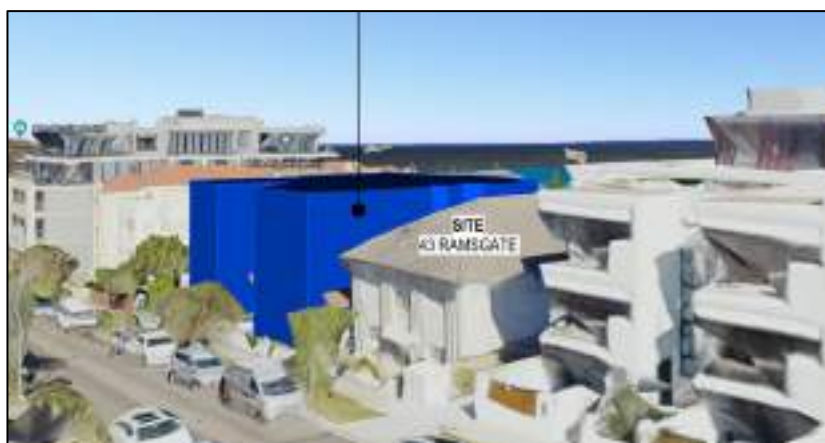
View of site and adjoining building envelopes from Unit 7, 56 Ramsgate Ave looking south-east
